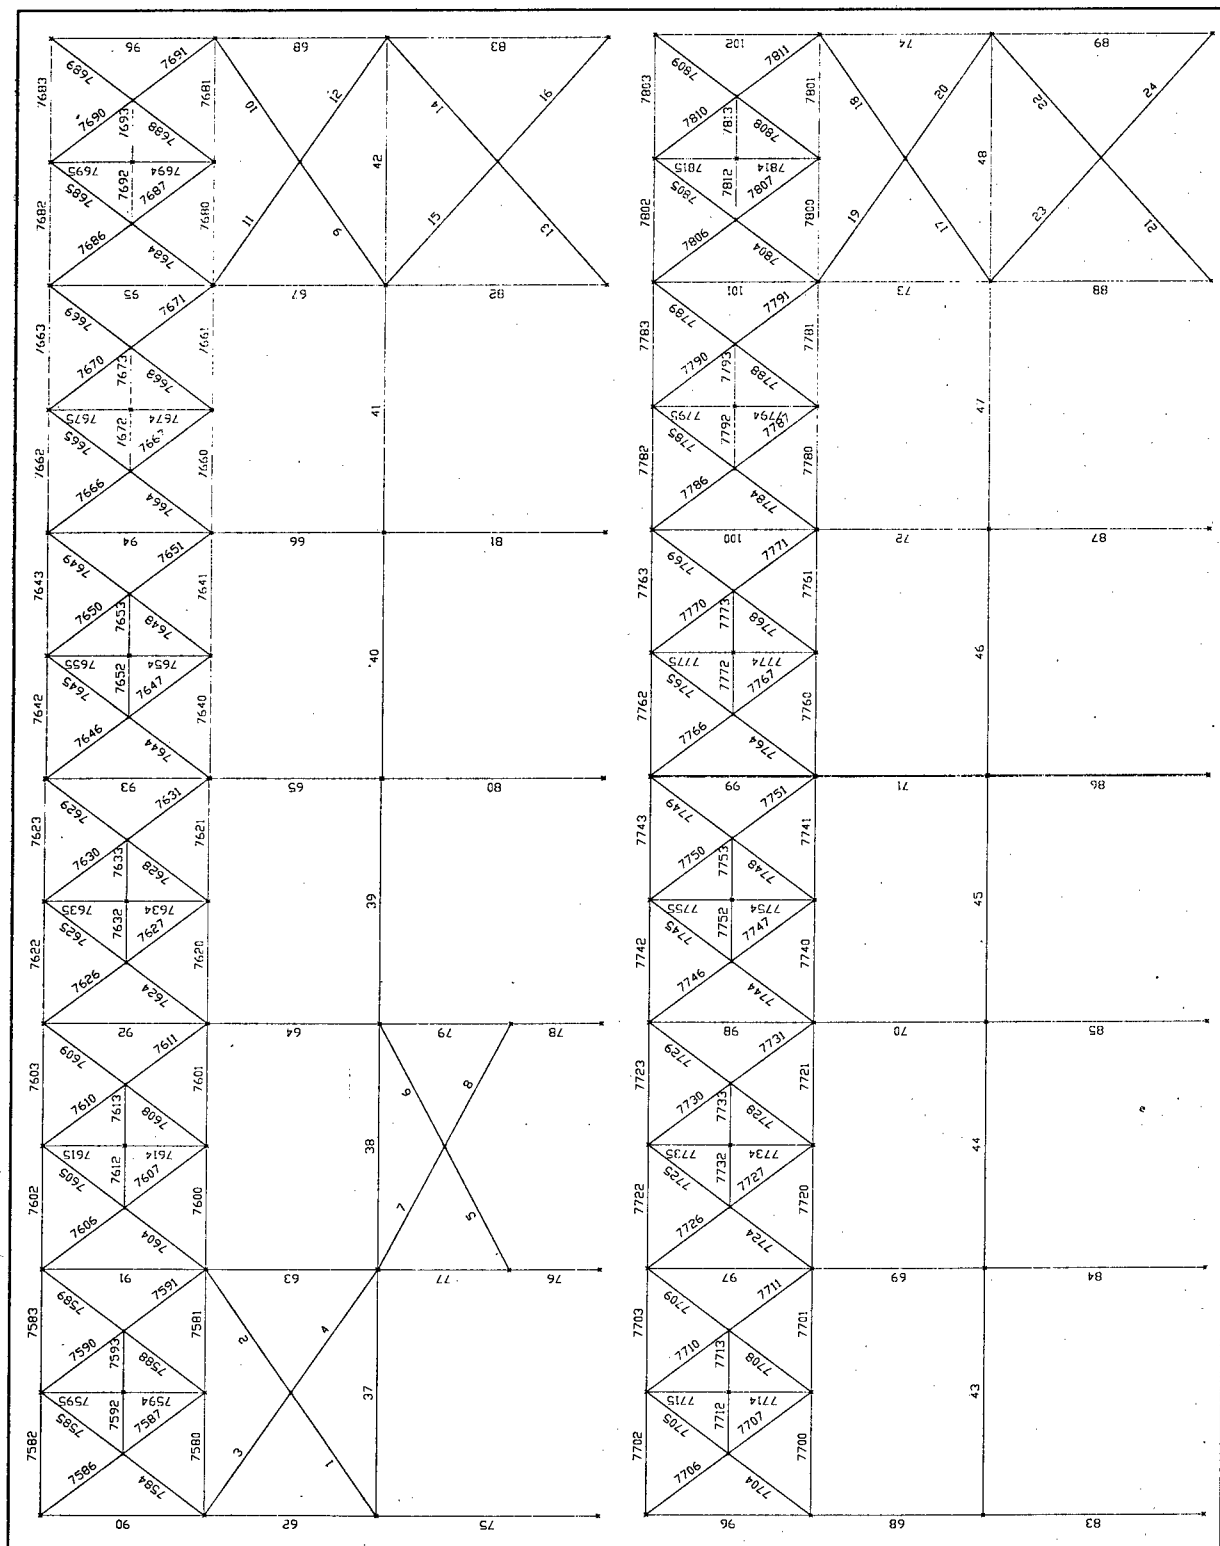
CCAD, TX, element numbers for Truss SF-II, Hangars 44 and 45.
